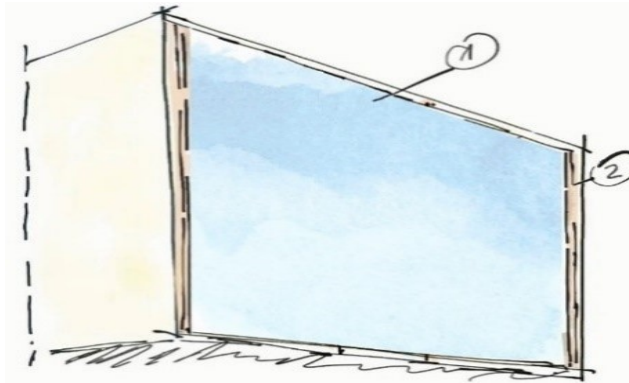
Conceptual drawing of a Trombe wall: 1 – External transparent skin (glazing); 2 – Frame of the glazing.
